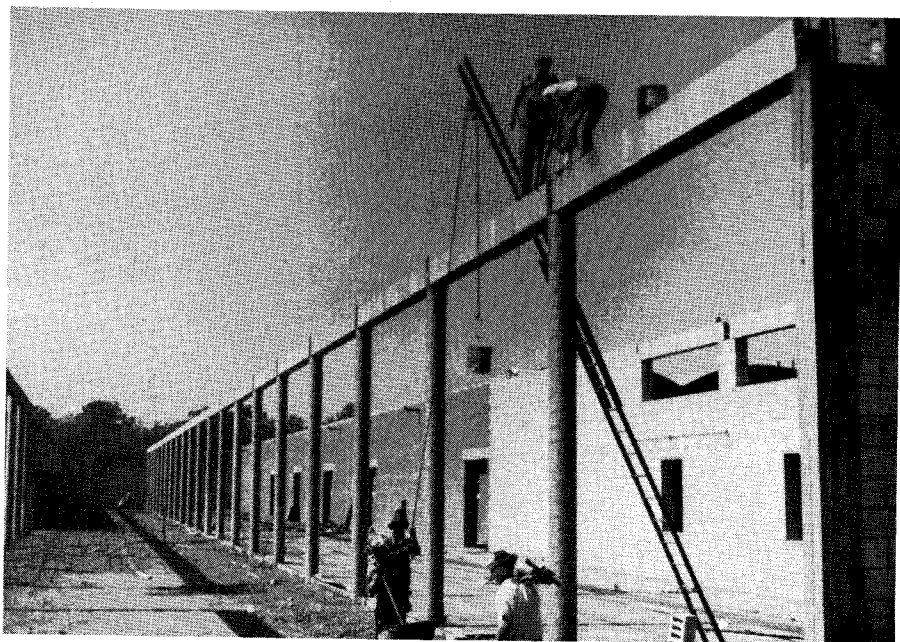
Grouting continuity steel in 12 x 16-in. (305 x 406 mm) block beams of 40,000 sq ft (3720 m²) warehouse for General Shoe Corporation.
